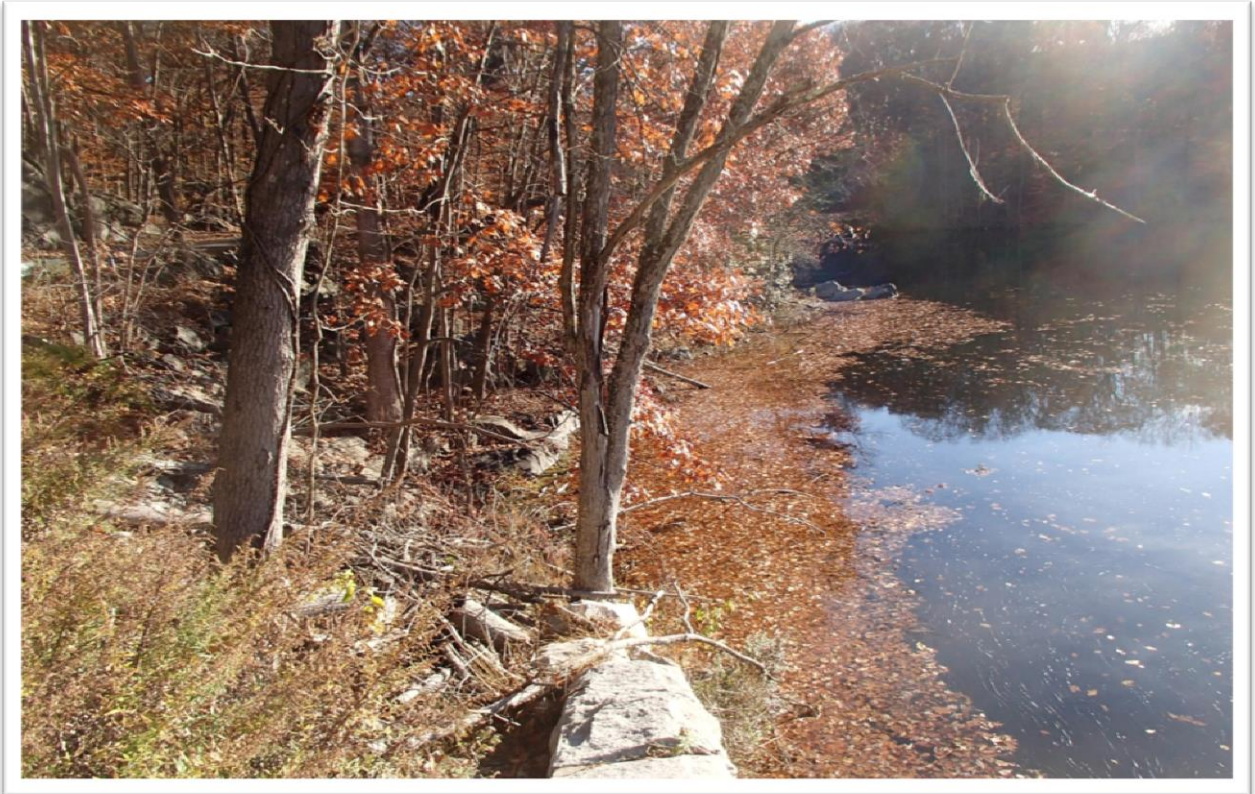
Photo A Baptist Church Road Bridge: View facing west showing non-wetland water edge of New Croton Reservoir along toe of roadway slope. Date Taken: November 7, 2018.
